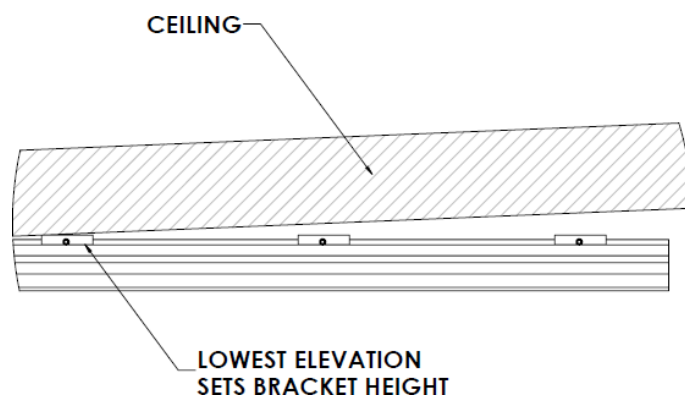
Lowest Elevation Point Where the Ceiling Brackets Will Be Installed
